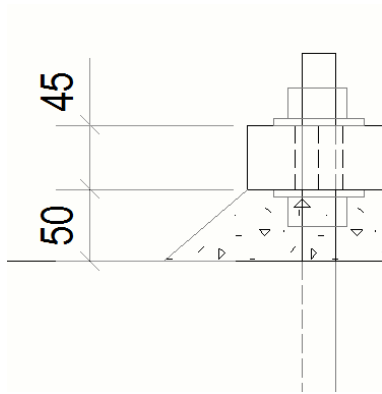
Dimensions indicated in an anchor bolt detail drawing.
